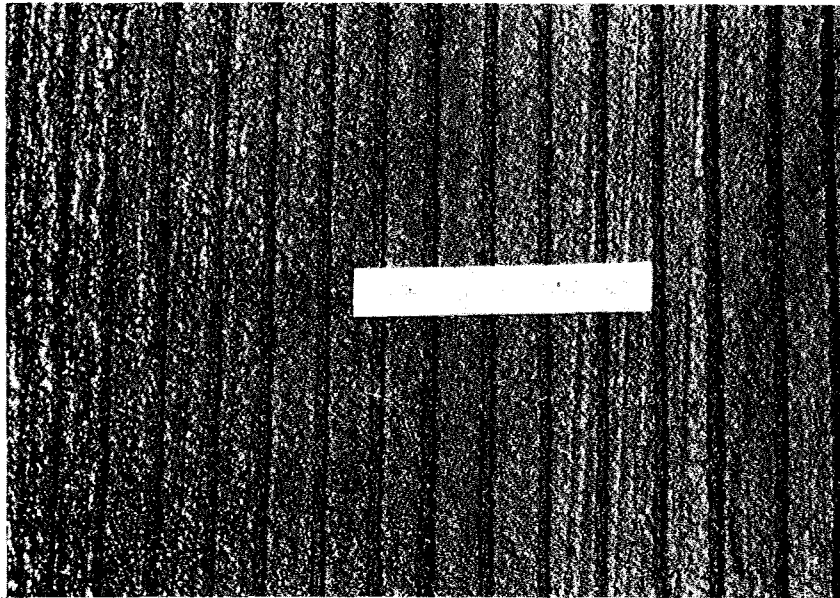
Test Section F-13: Burlap + 1 in.
